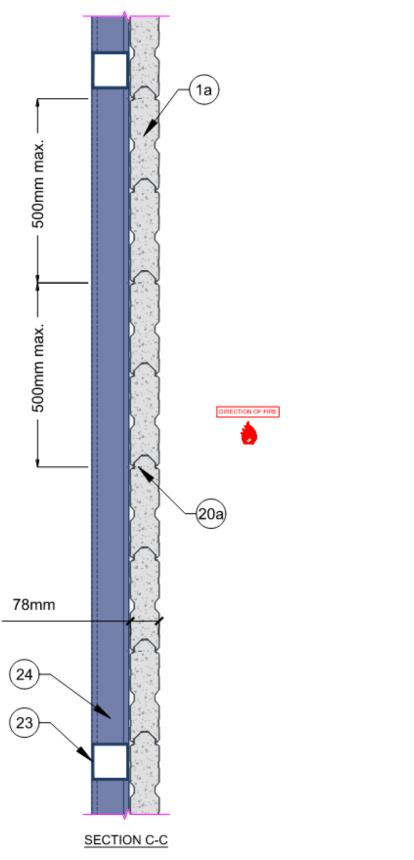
Speedpanel wall with unprotected framing – Z-purlin (plan view) – section C-C
